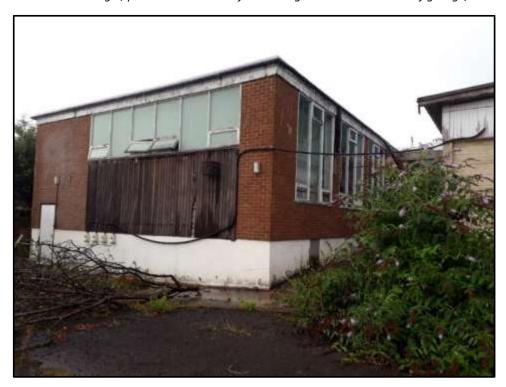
Building 7, part north and east elevation of main L shape range; garage/store to right of image
